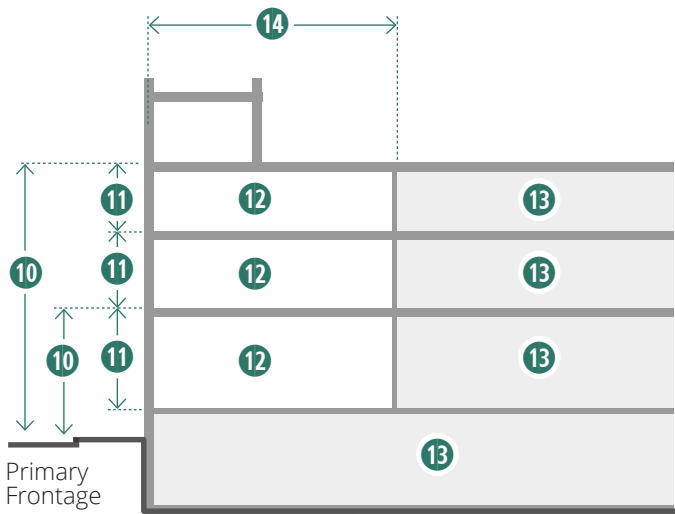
H-2. Civic Building: Height & Use Requirements
